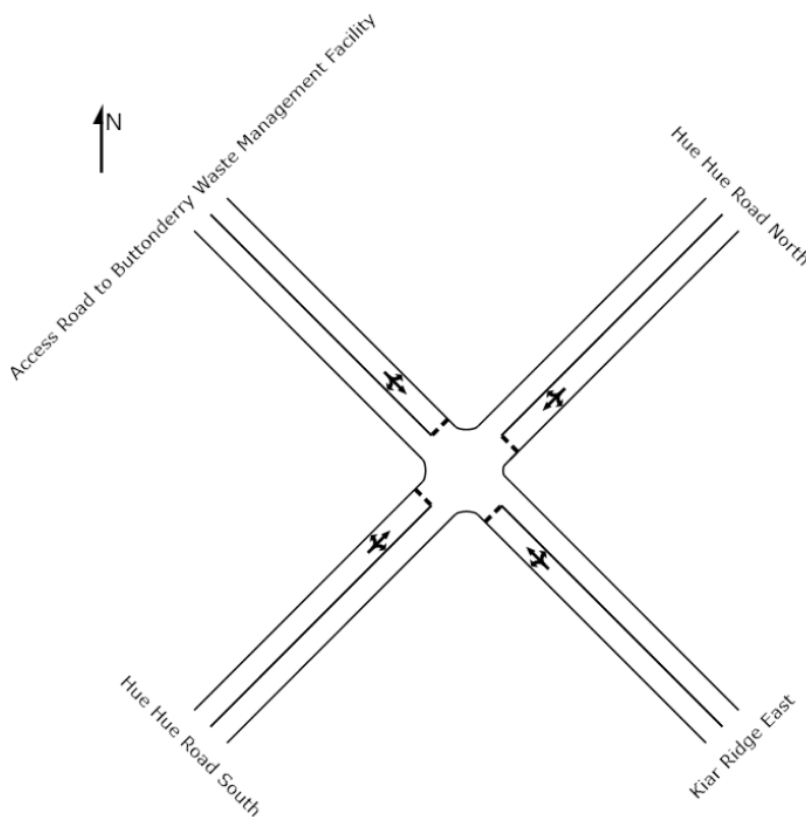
Intersection Layout on Hue Hue Road and Kiar Ridge Road
